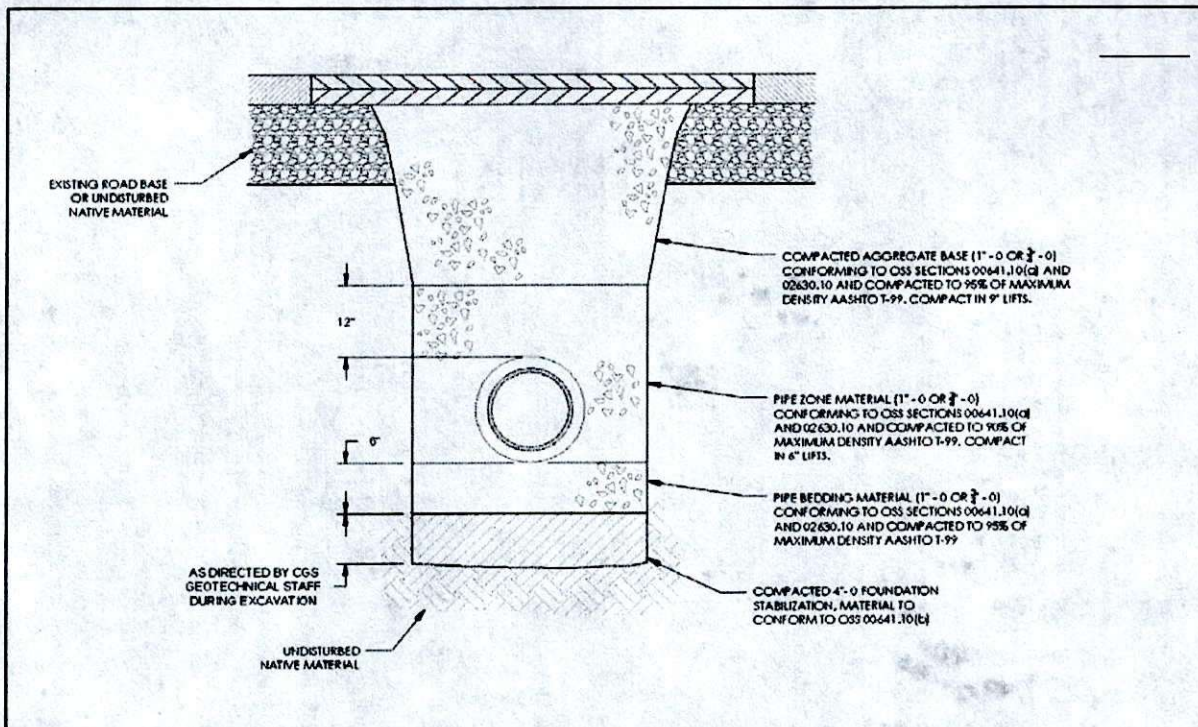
Figure B – Trench in ROW, Under Structure or Pavement, Etc.
